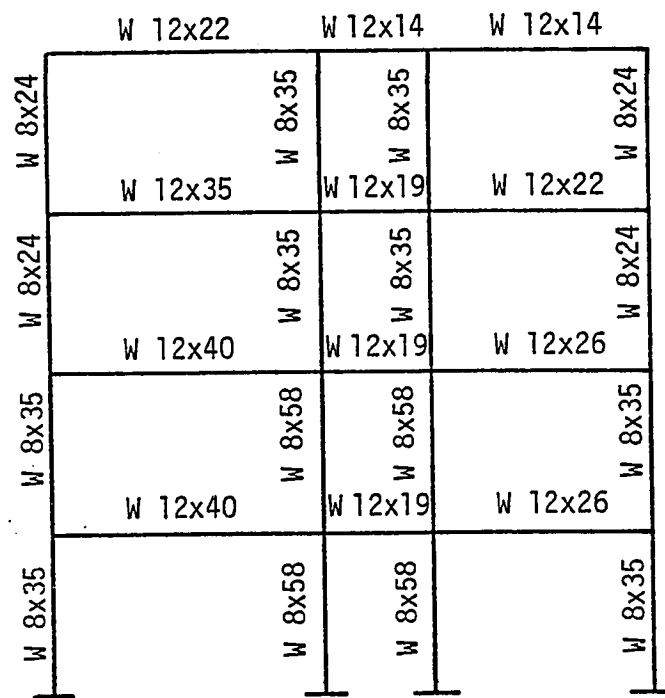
Beam and Column Sections for Four Story, Three Bay Steel Frame
